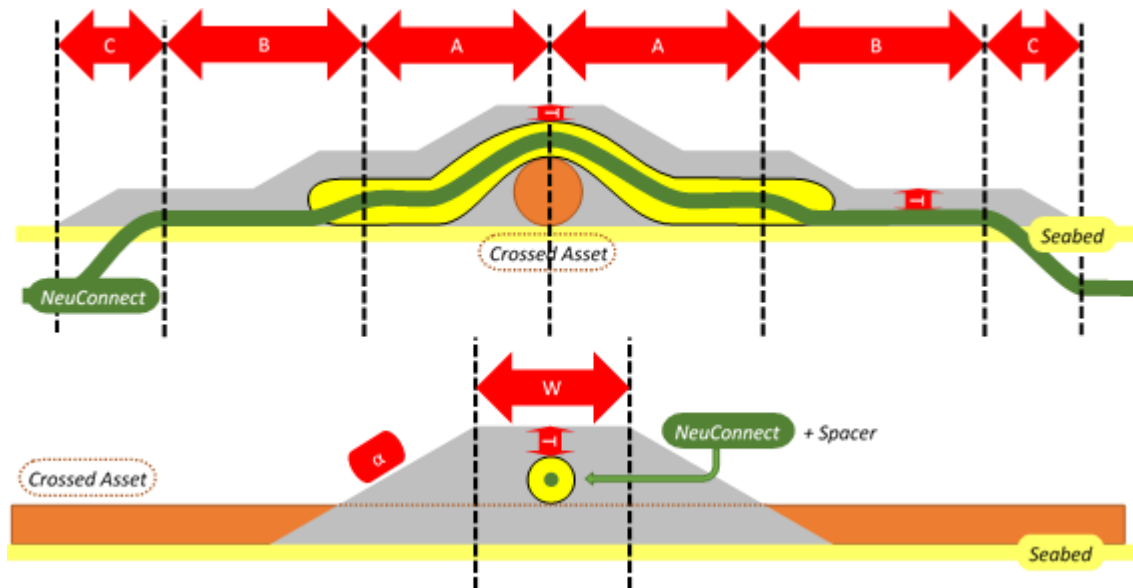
Definition of Proposed Dimensions Type E Crossing
